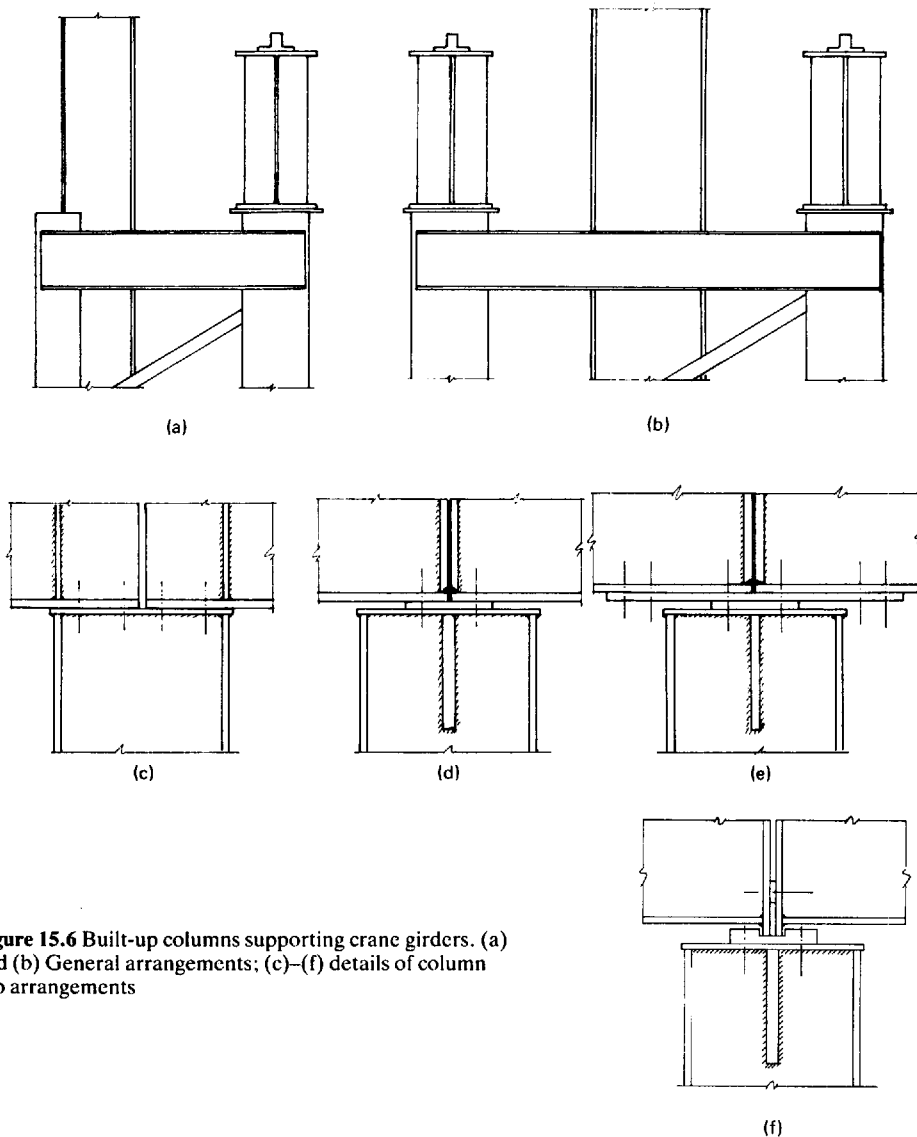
Built-up columns supporting crane girders. (a) and (b) General arrangements; (c)–(f) details of column cap arrangements
